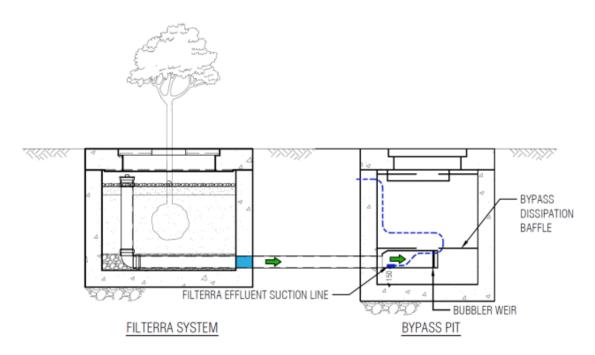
Schematic section of Filterra monitoring system and bypass pit
